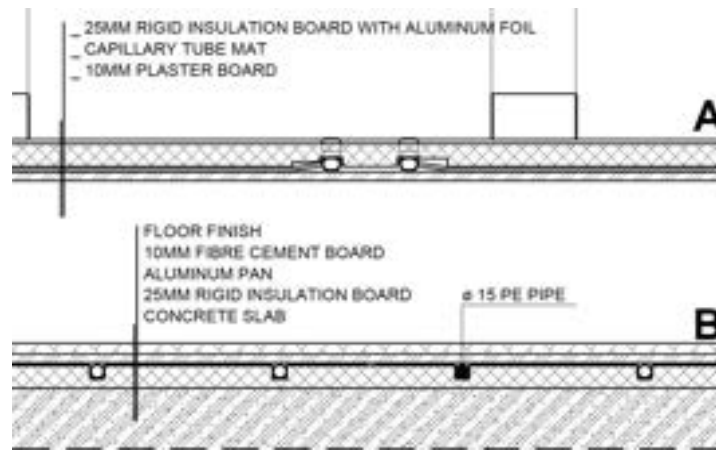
(A) Radiant ceiling section, (B) Radiant floor section
